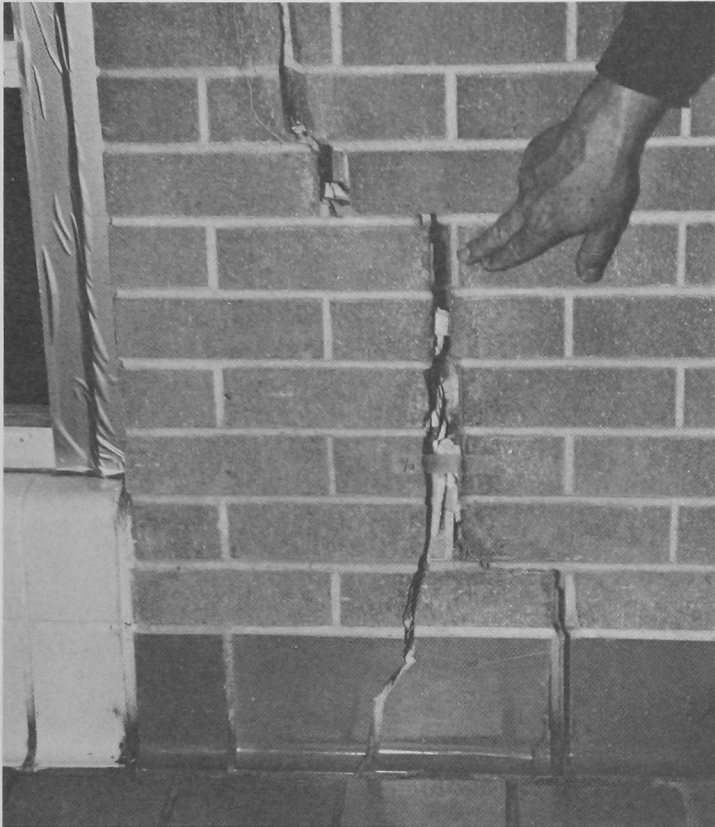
The bricks in this wall were split by pressures from swelling soil.
